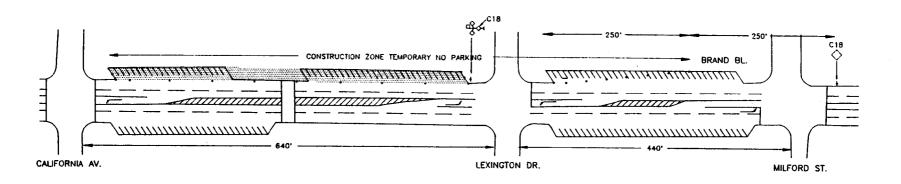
CONCEPTUAL CONSTRUCTION ZONE ALONG COLORADO BOULEVARD
